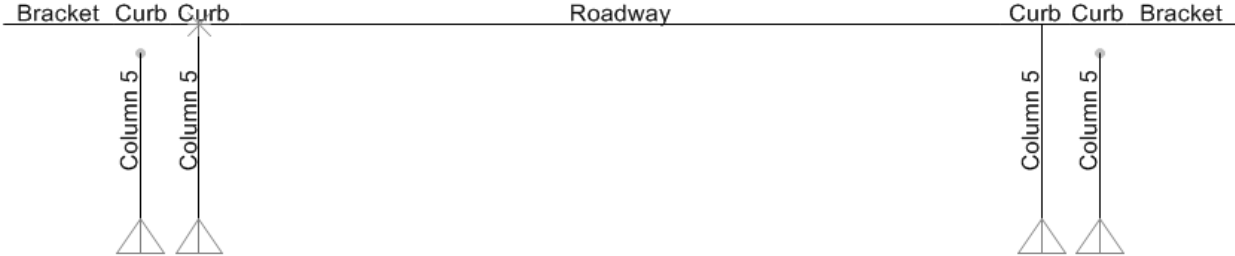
Span VII Beam and Column 5 Model – Case A (SAP 2013)
